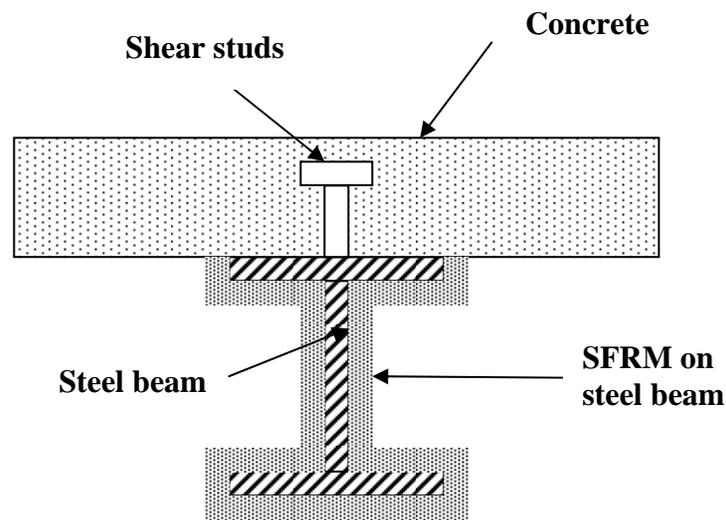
Cross-section of reinforced concrete & steel beam composite floor assembly.
